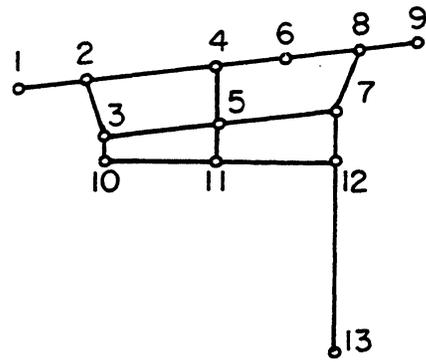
TAPERED CONTINUOUS BOX GIRDER BRIDGE
